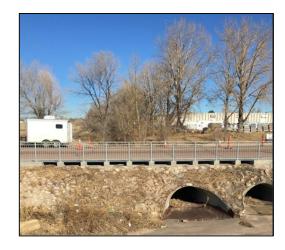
Existing Drainage Structures at Galley Road (Viewed from South)
